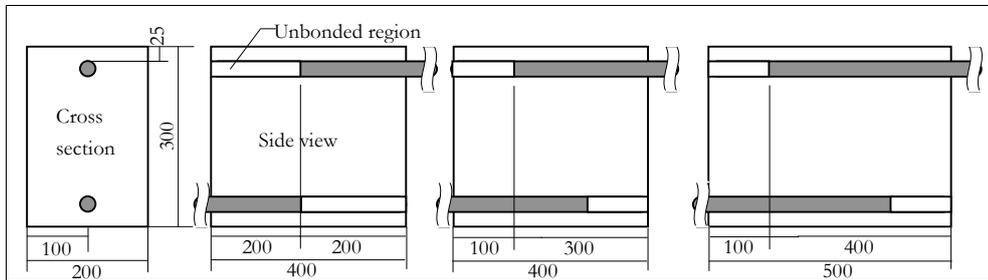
Shape and dimensions of the D10 pull-out type test specimen (dimensions in mm).
